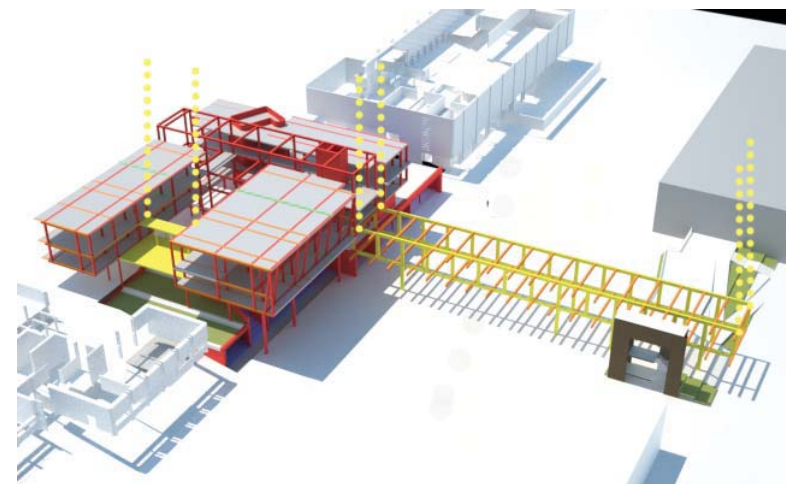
\_Vierendeel trusses used on bridge structures in the north - south orientation
